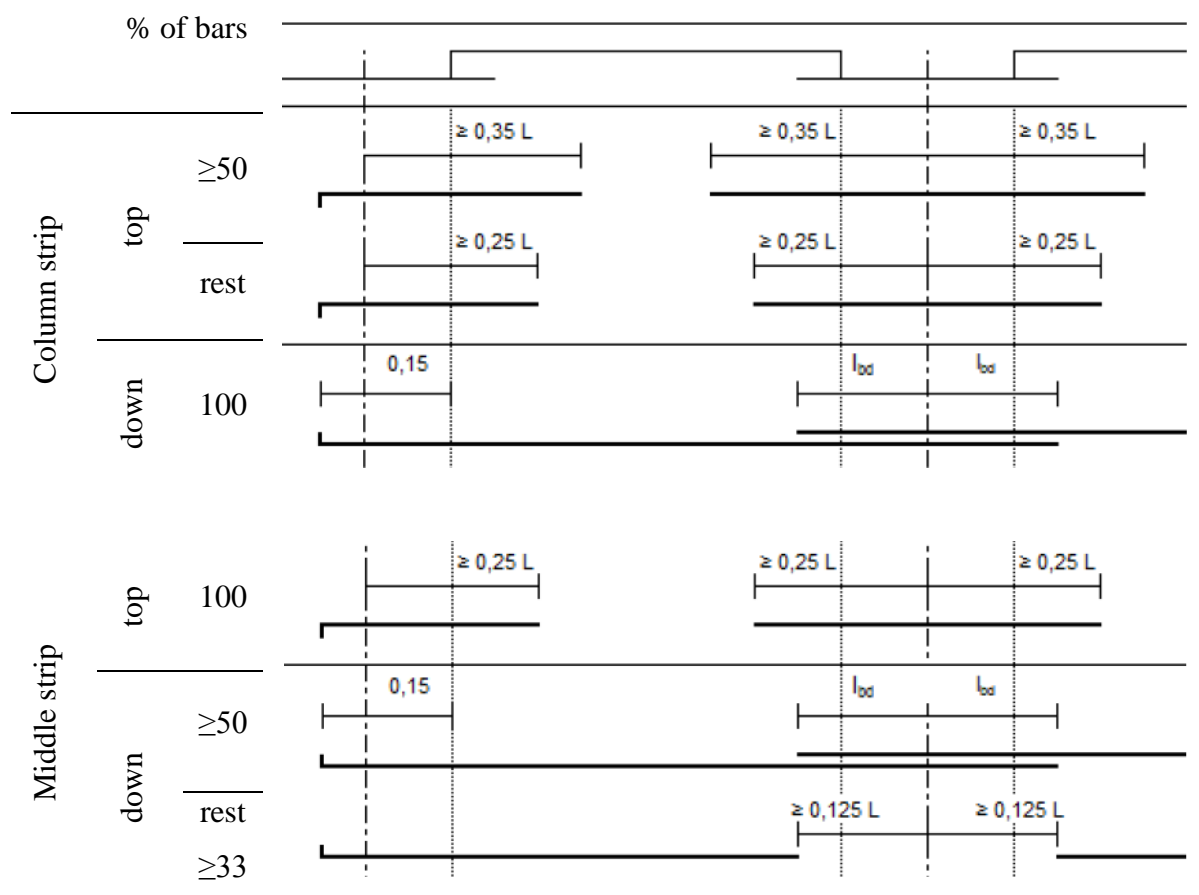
Minimum anchorage of reinforcement in flat slabs (Tesoro, 1991).
